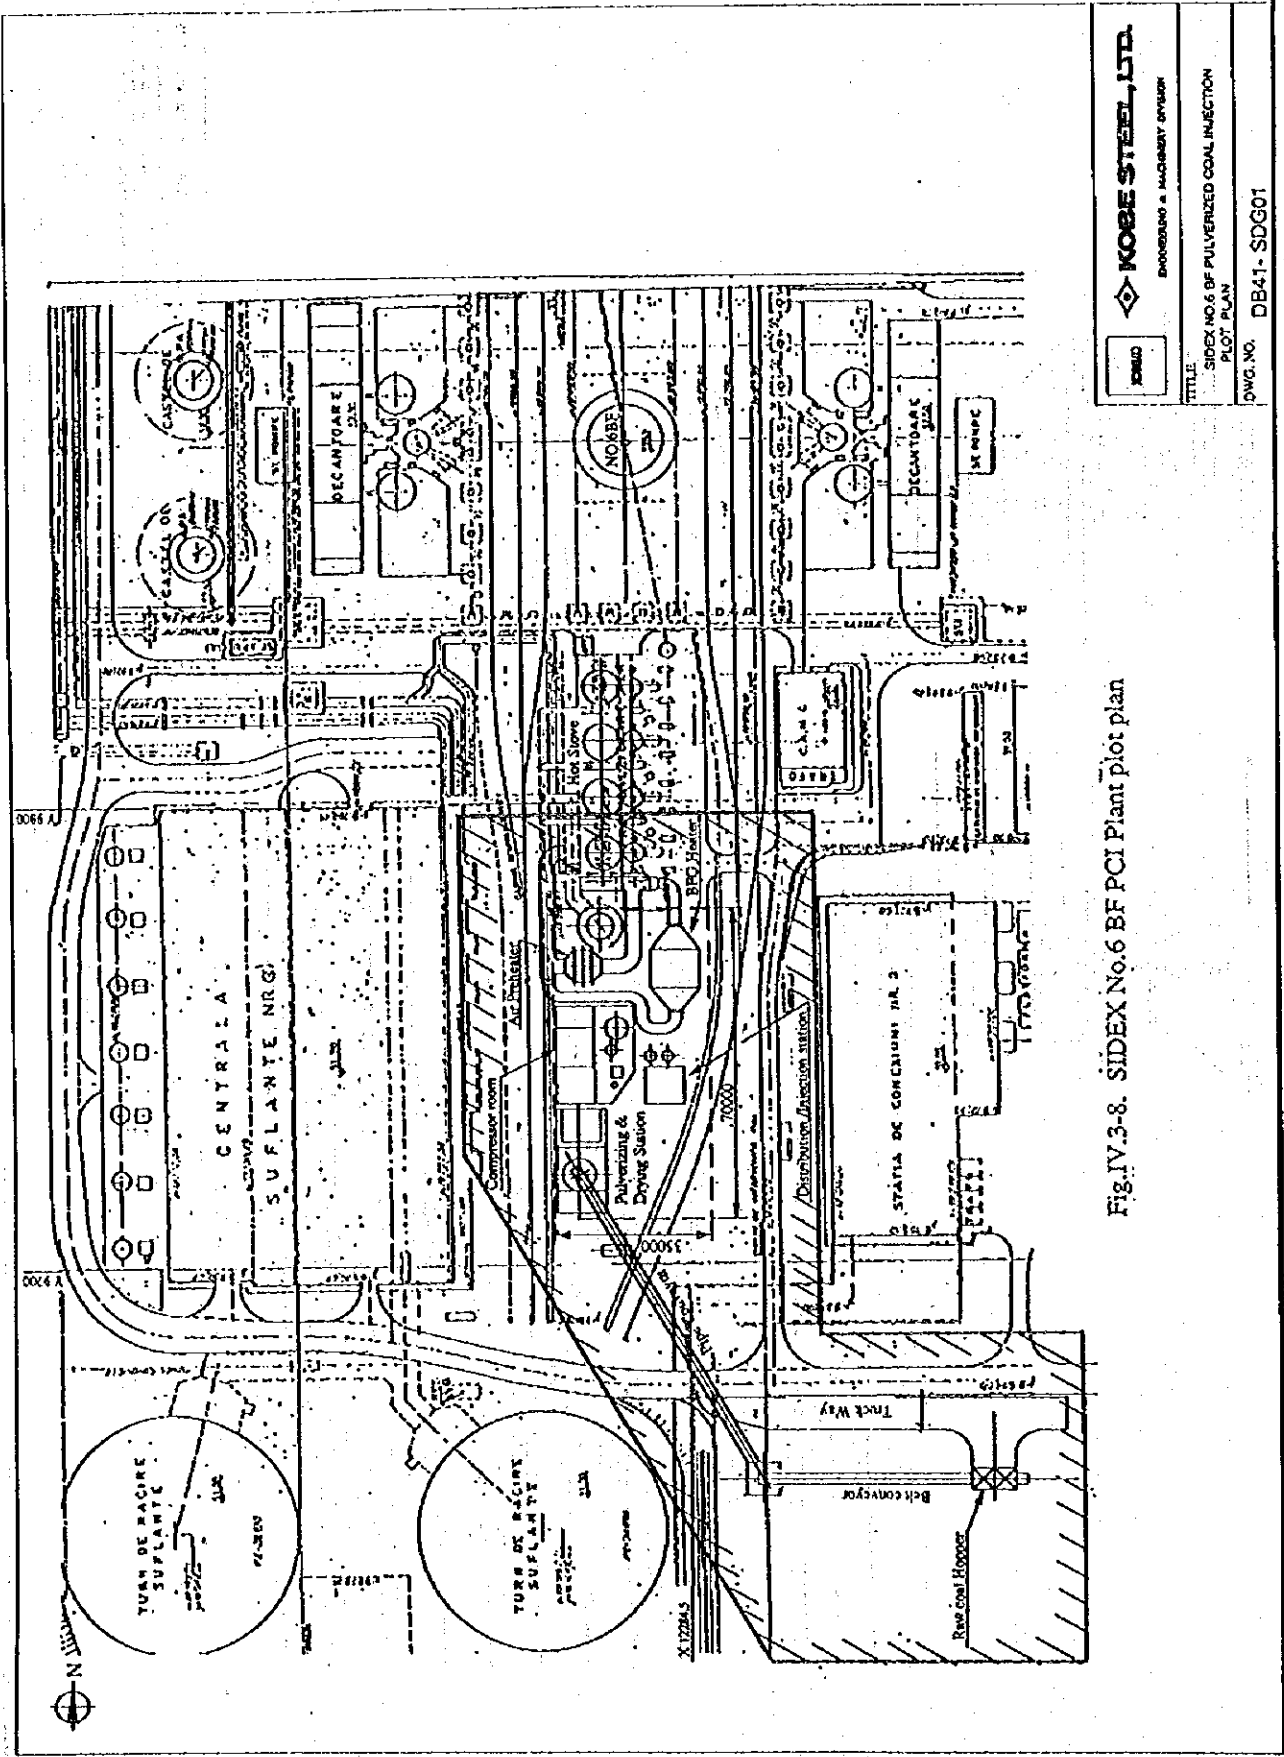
SIDEX No. 6 BF PCI Plant plot plan
